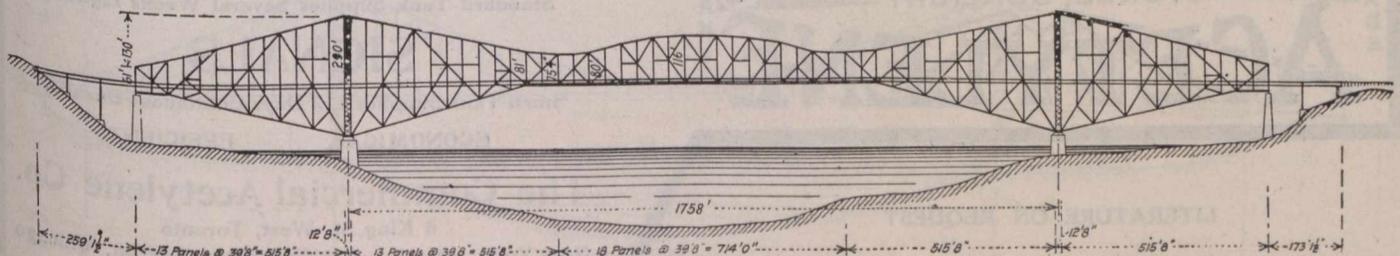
Unaccepted design M-N of St. Lawrence Bridge Co., for new bridge.
